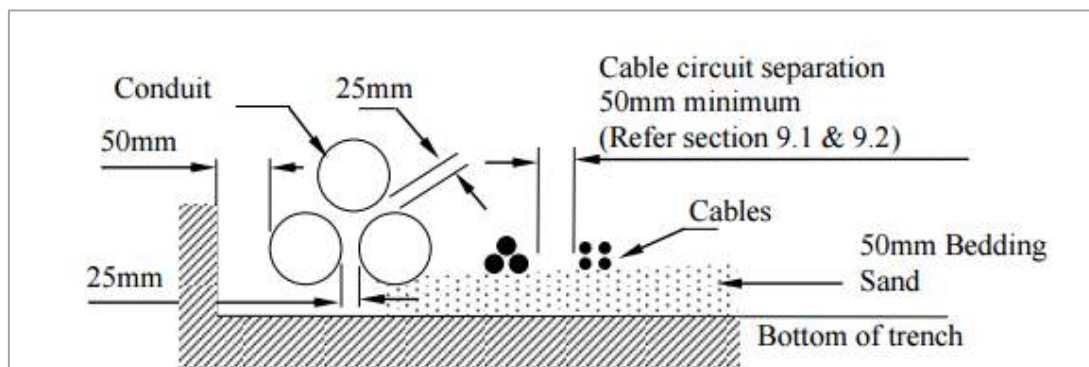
Trenching (it shows a typical SAPN conduit and cable arrangement)
